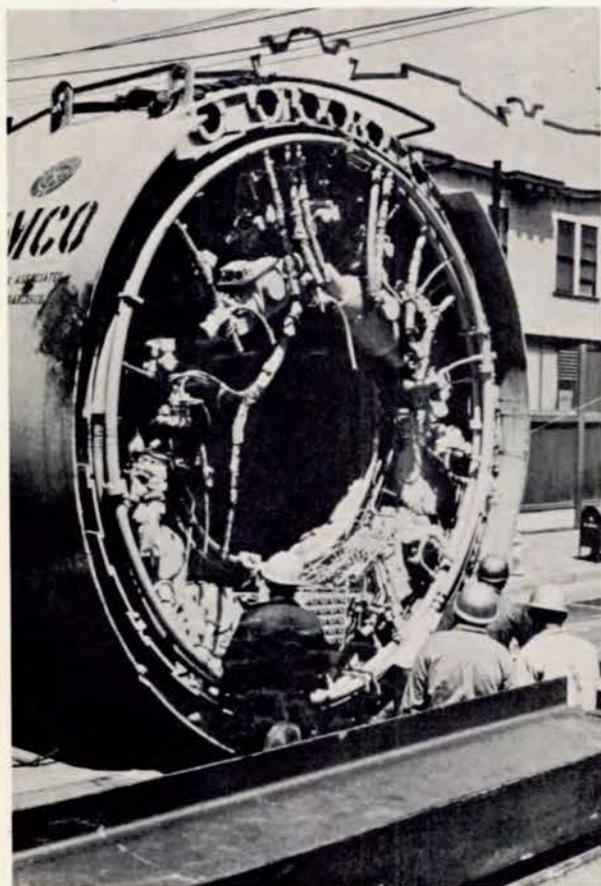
Rear view of tunneling machine's cutting wheel, used in BART project.
